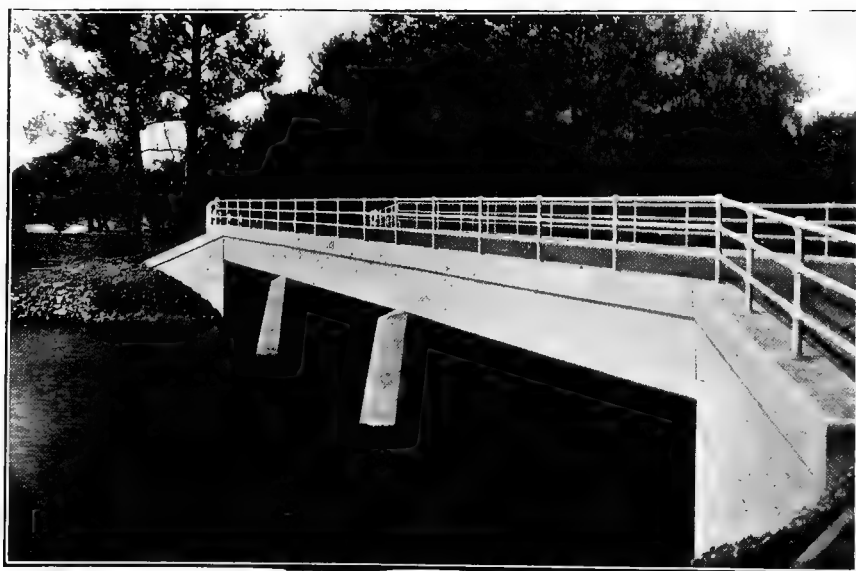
ARCH CULVERT FOR TEN-FOOT SPAN.
